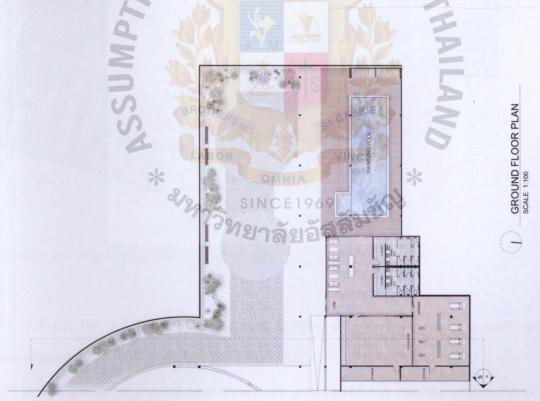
GROUND FLOOR FURNITURE LAYOUT PLAN
